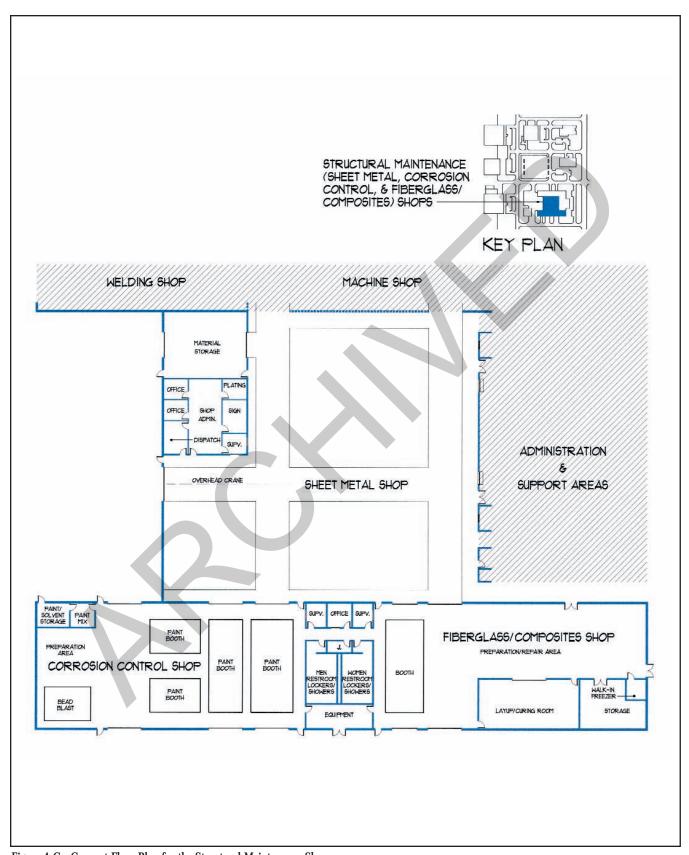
C: Concept Floor Plan for the Structural Maintenance Shops.
